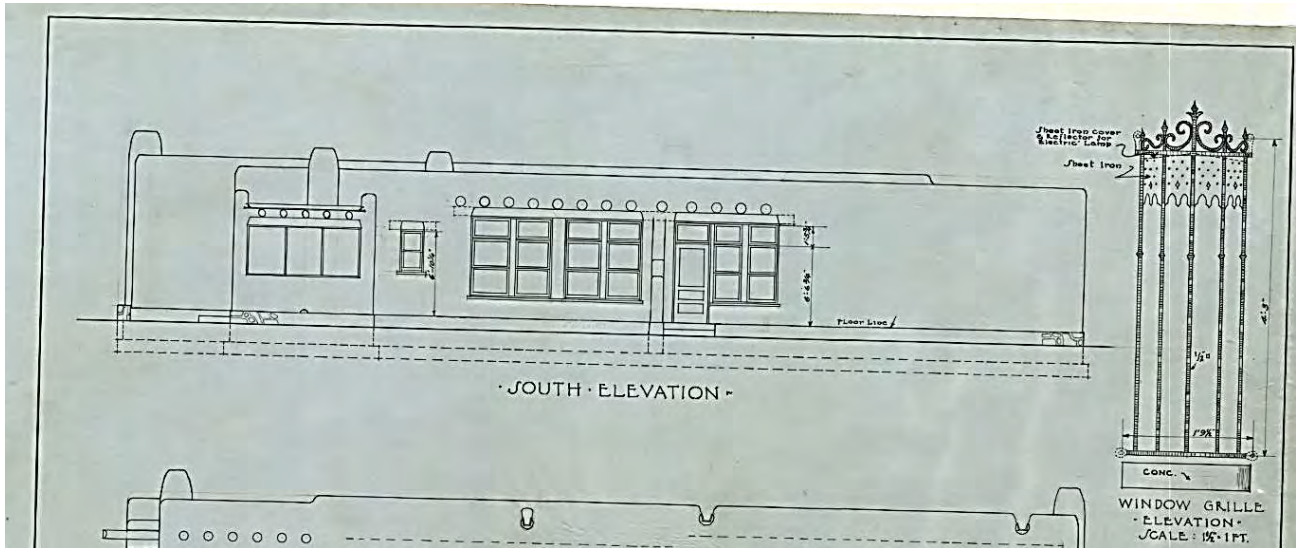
Construction drawing, south elevation, May 25, 1925.
